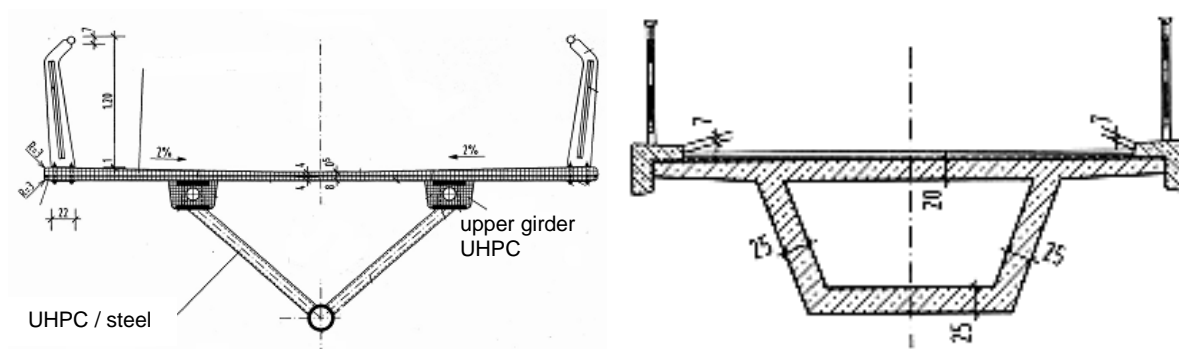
Comparison of the cross sections evaluated. Left: existing design with UHPC and a steel truss (version 1 in Tab. 2) or with a truss made of UHPC (version 2 in Tab. 2). Right: Conventional design consisting of prestressed ordinary concrete (version 3 in Tab. 2).
